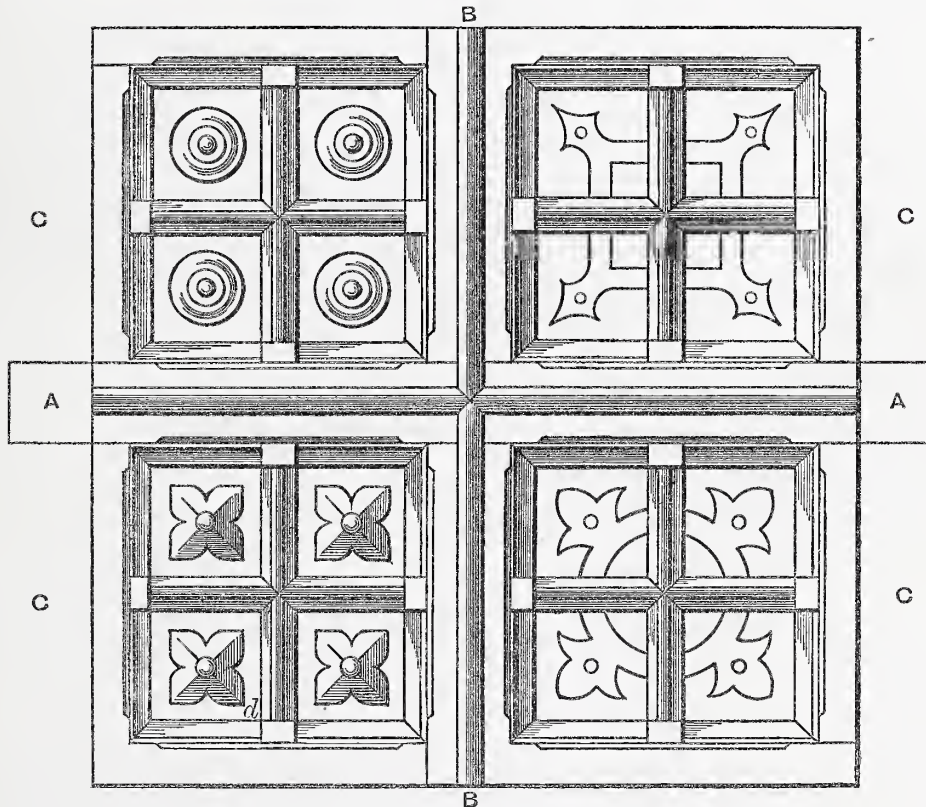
Wood Ceiling of Hall, with Four Alternative Designs for Panels.
